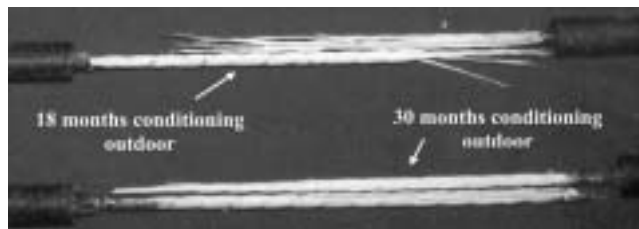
Failure of GFRP reinforcing bars in typical broom shape.
